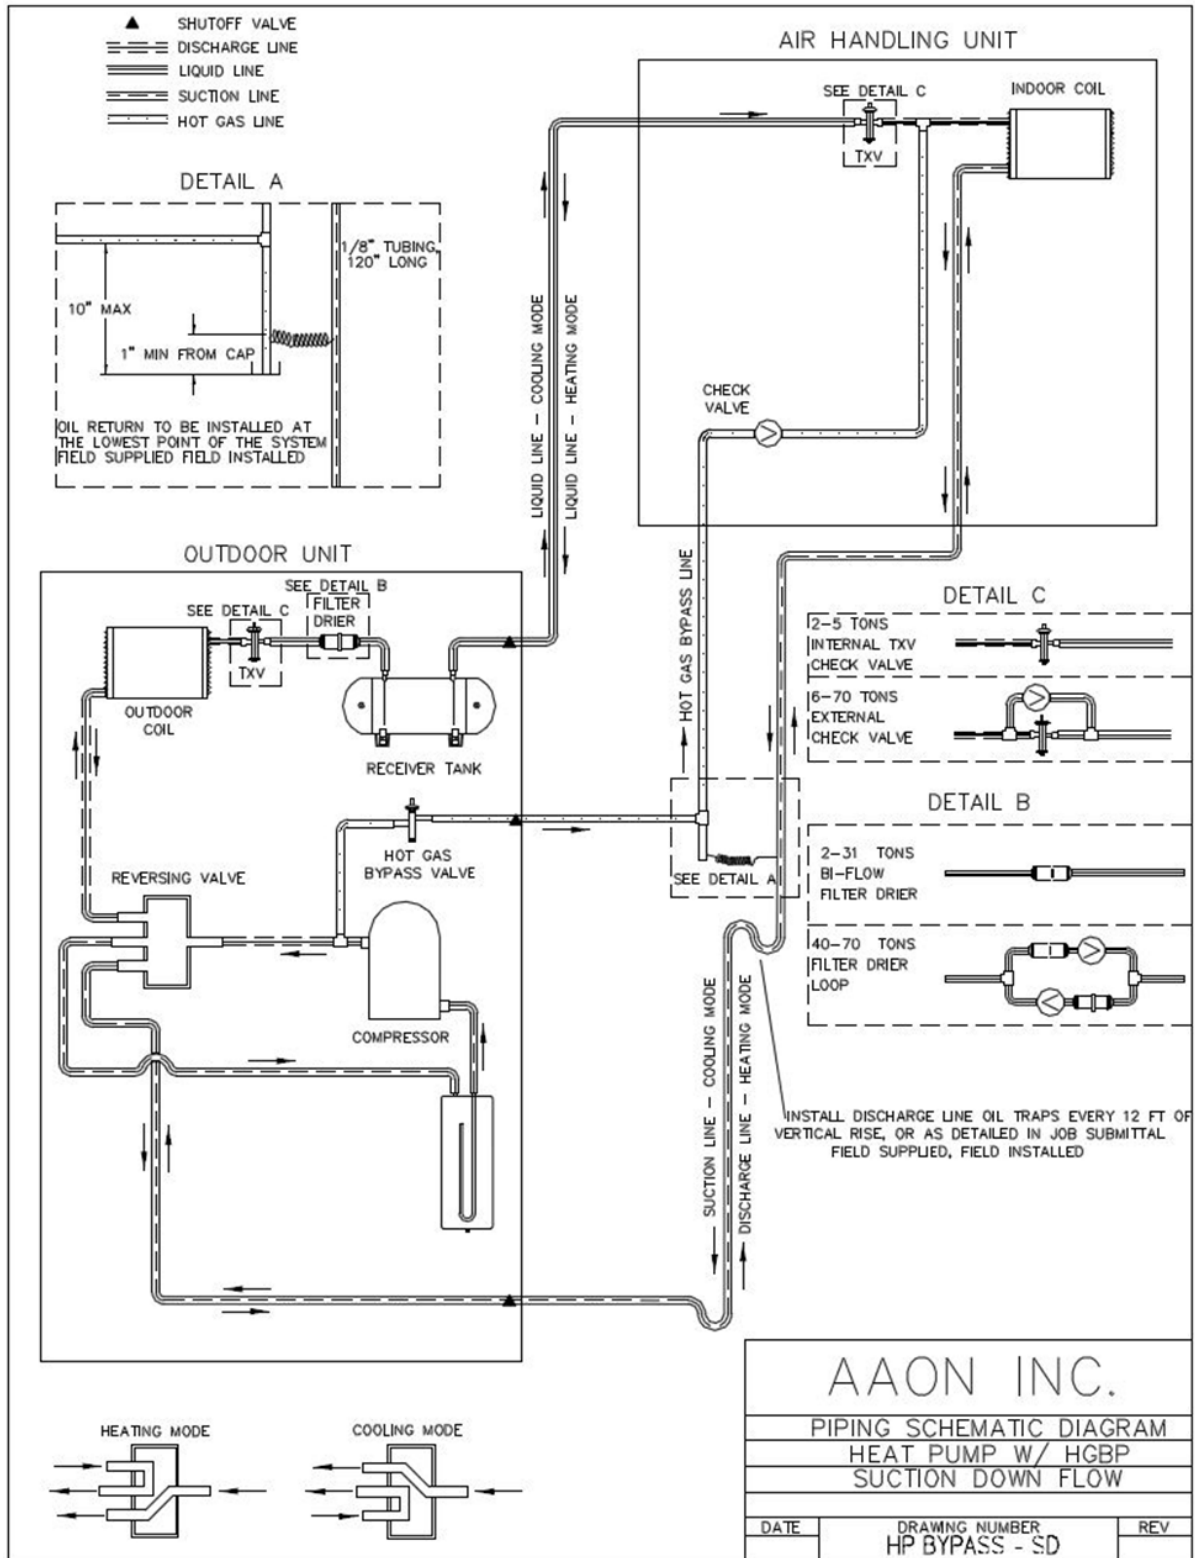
Heat Pump with Hot Gas Bypass Split System Piping, Suction Down
